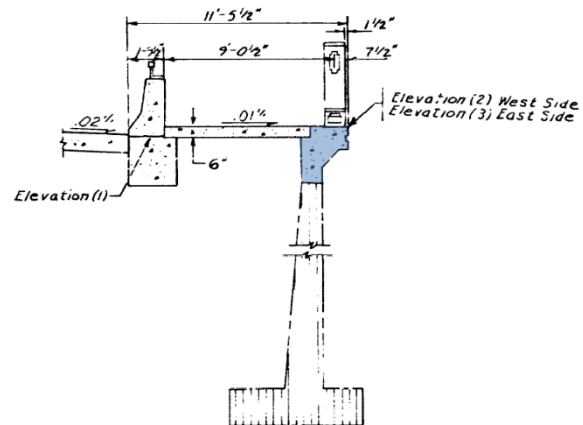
Section through north retaining wall showing 1980 concrete cap (shaded blue).
